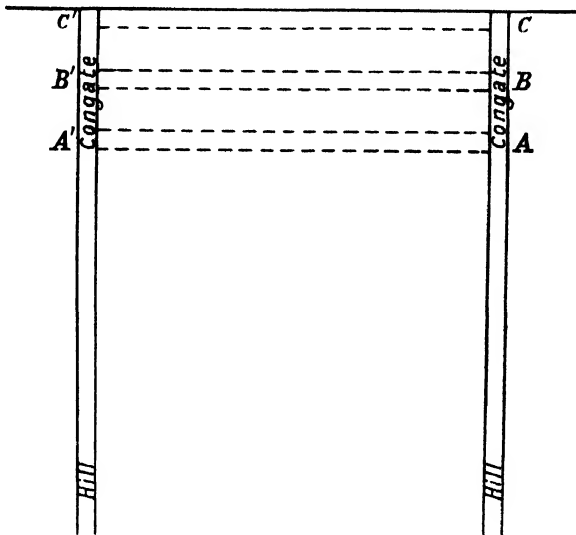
“HILL” SYSTEM, DETAILED PLAN OF WORKINGS. (Not drawn to Scale.)
